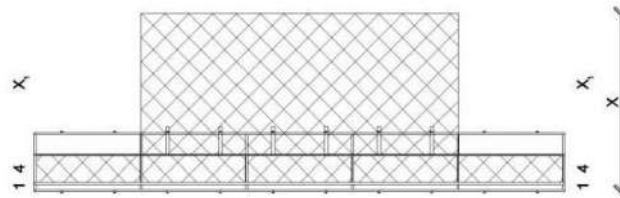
Floor module with EPS inter joist to create a girder-slab floor
